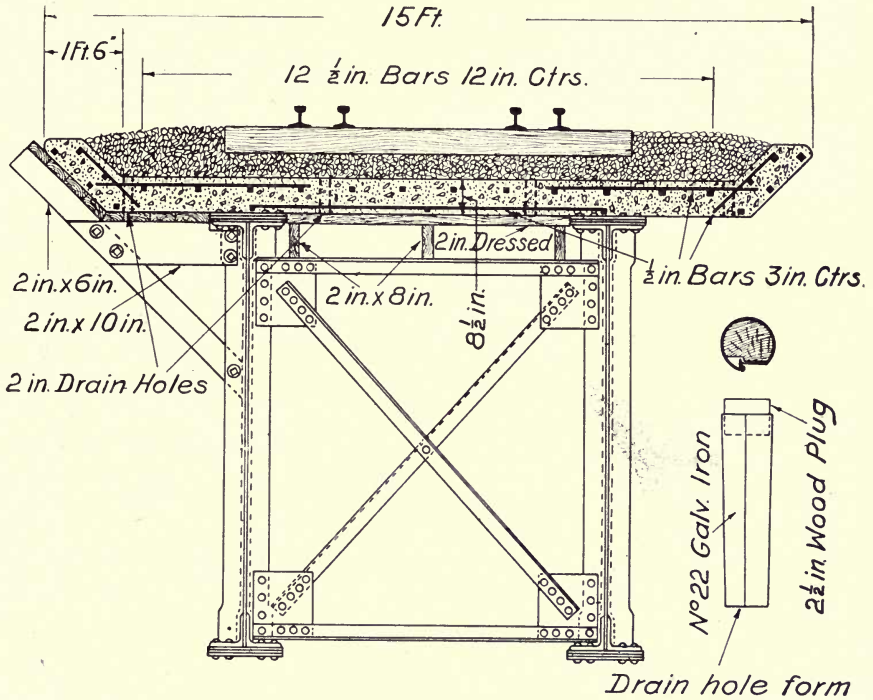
CROSS SECTION, DECK GIRDER BRIDGE FLOOR, C., B. & Q. R. R.
